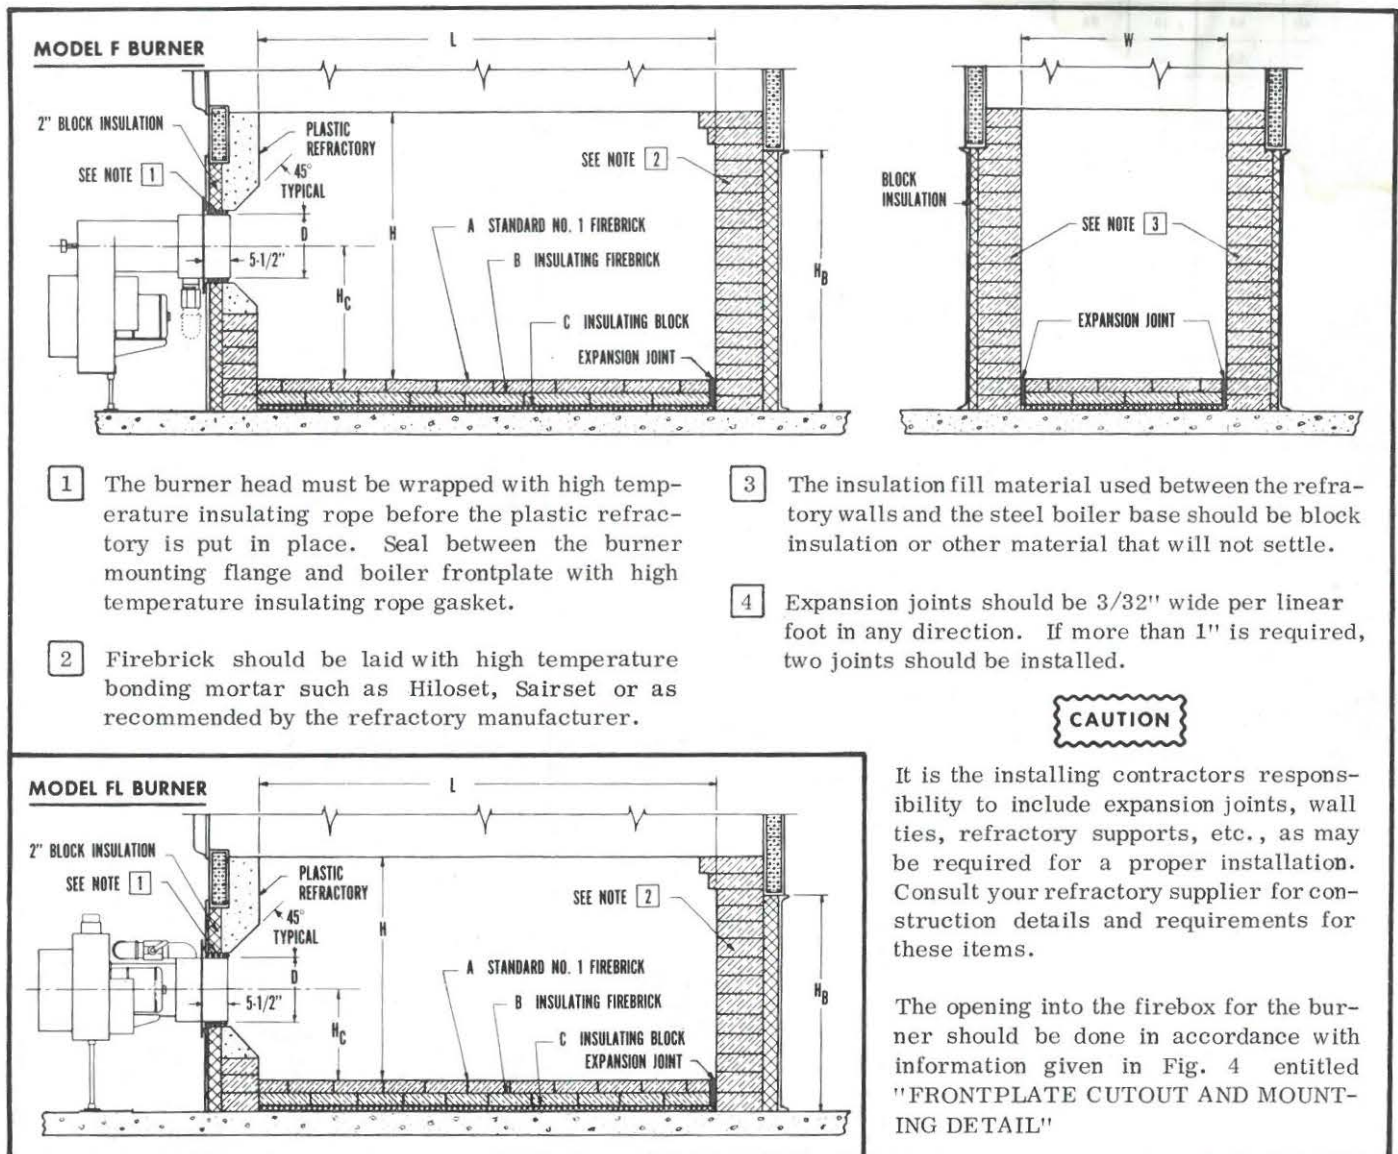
TYPICAL TYPE "F" BURNER INSTALLATION IN FIREBOX BOILER FIRING THROUGH FRONT OF BASE
